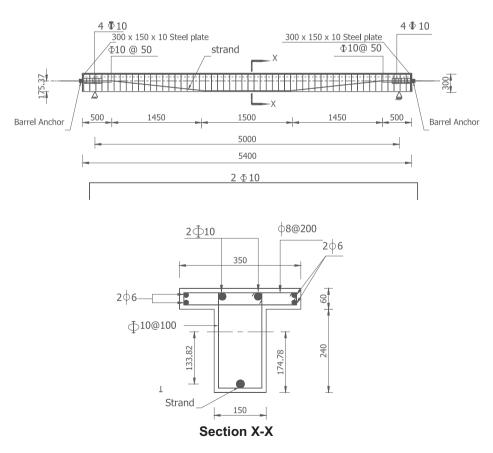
Flexural reinforcement for fully prestressed beams of group one. Typical details for fully prestressed beams of group one.
